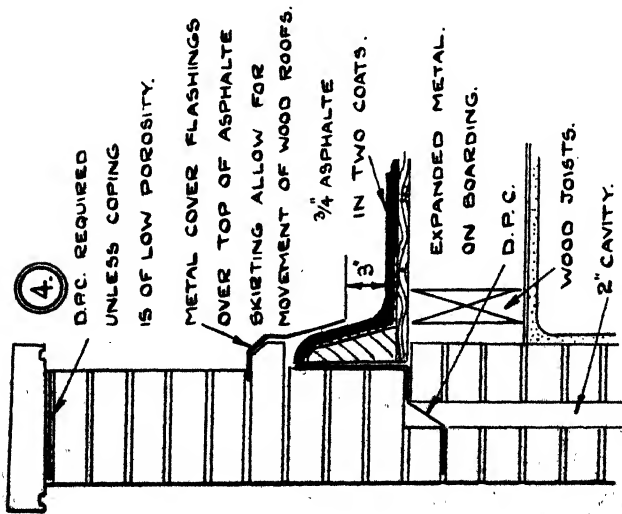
PARAPET SHOWING ASPHALTE FINISH ON TIMBER ROOF
